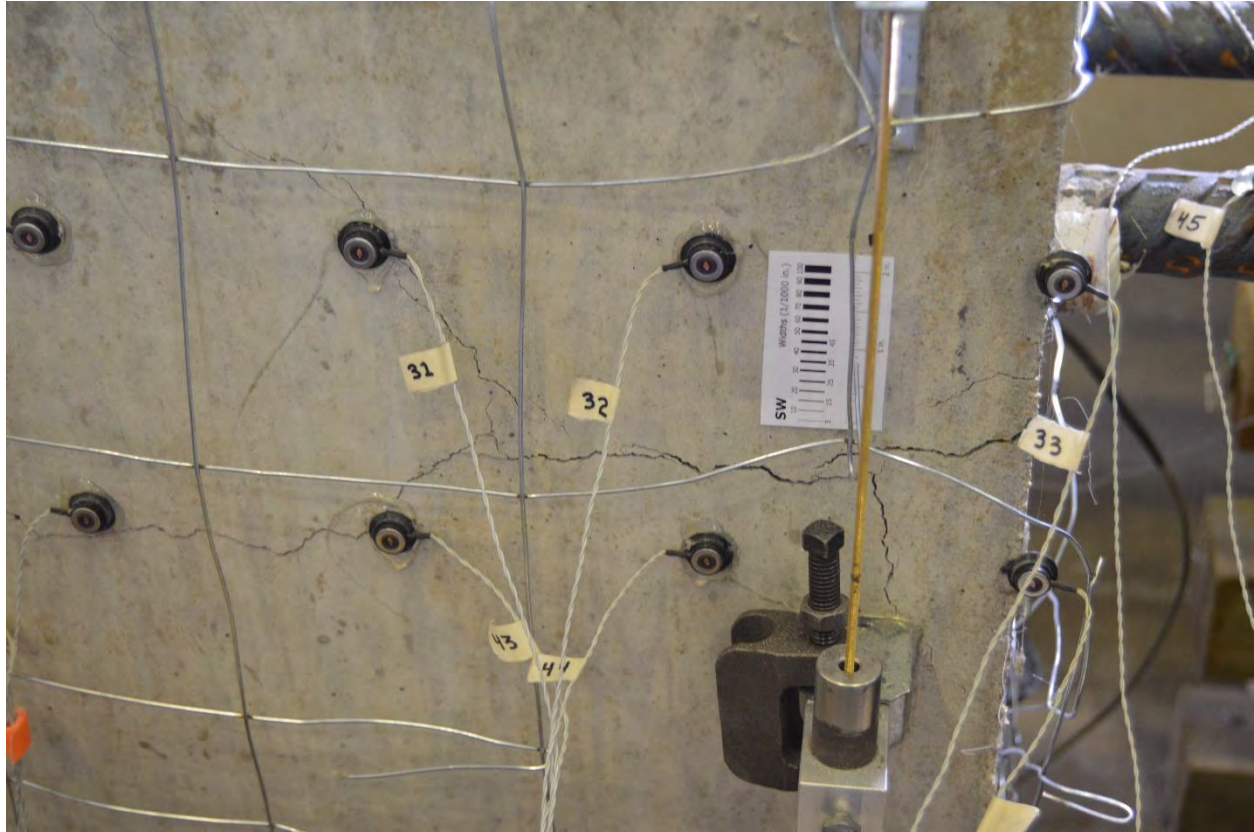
Test Photo Specimen D10, SW corner, 120 kips
